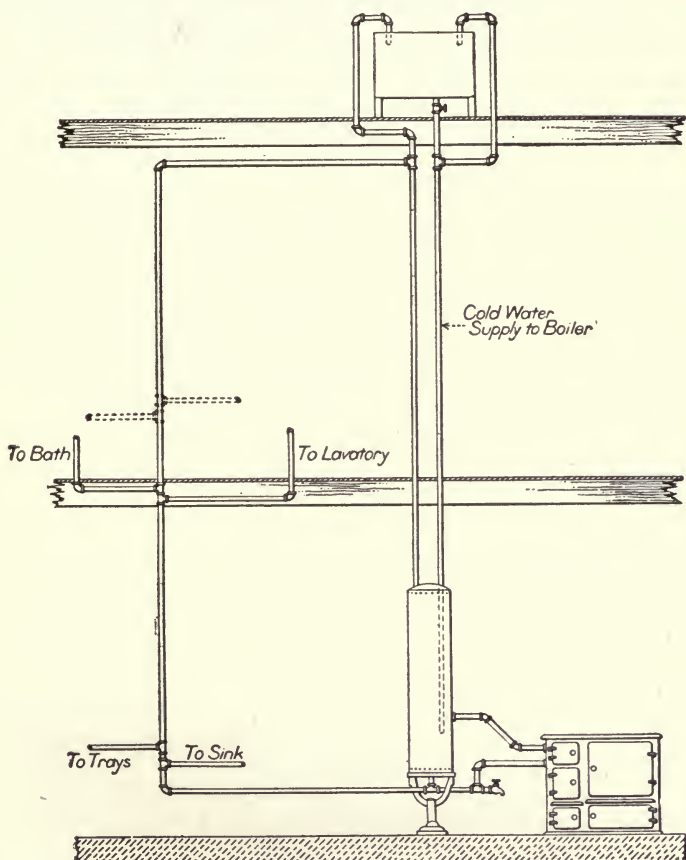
A System Which will Provide a Good Supply to all the Fixtures.
